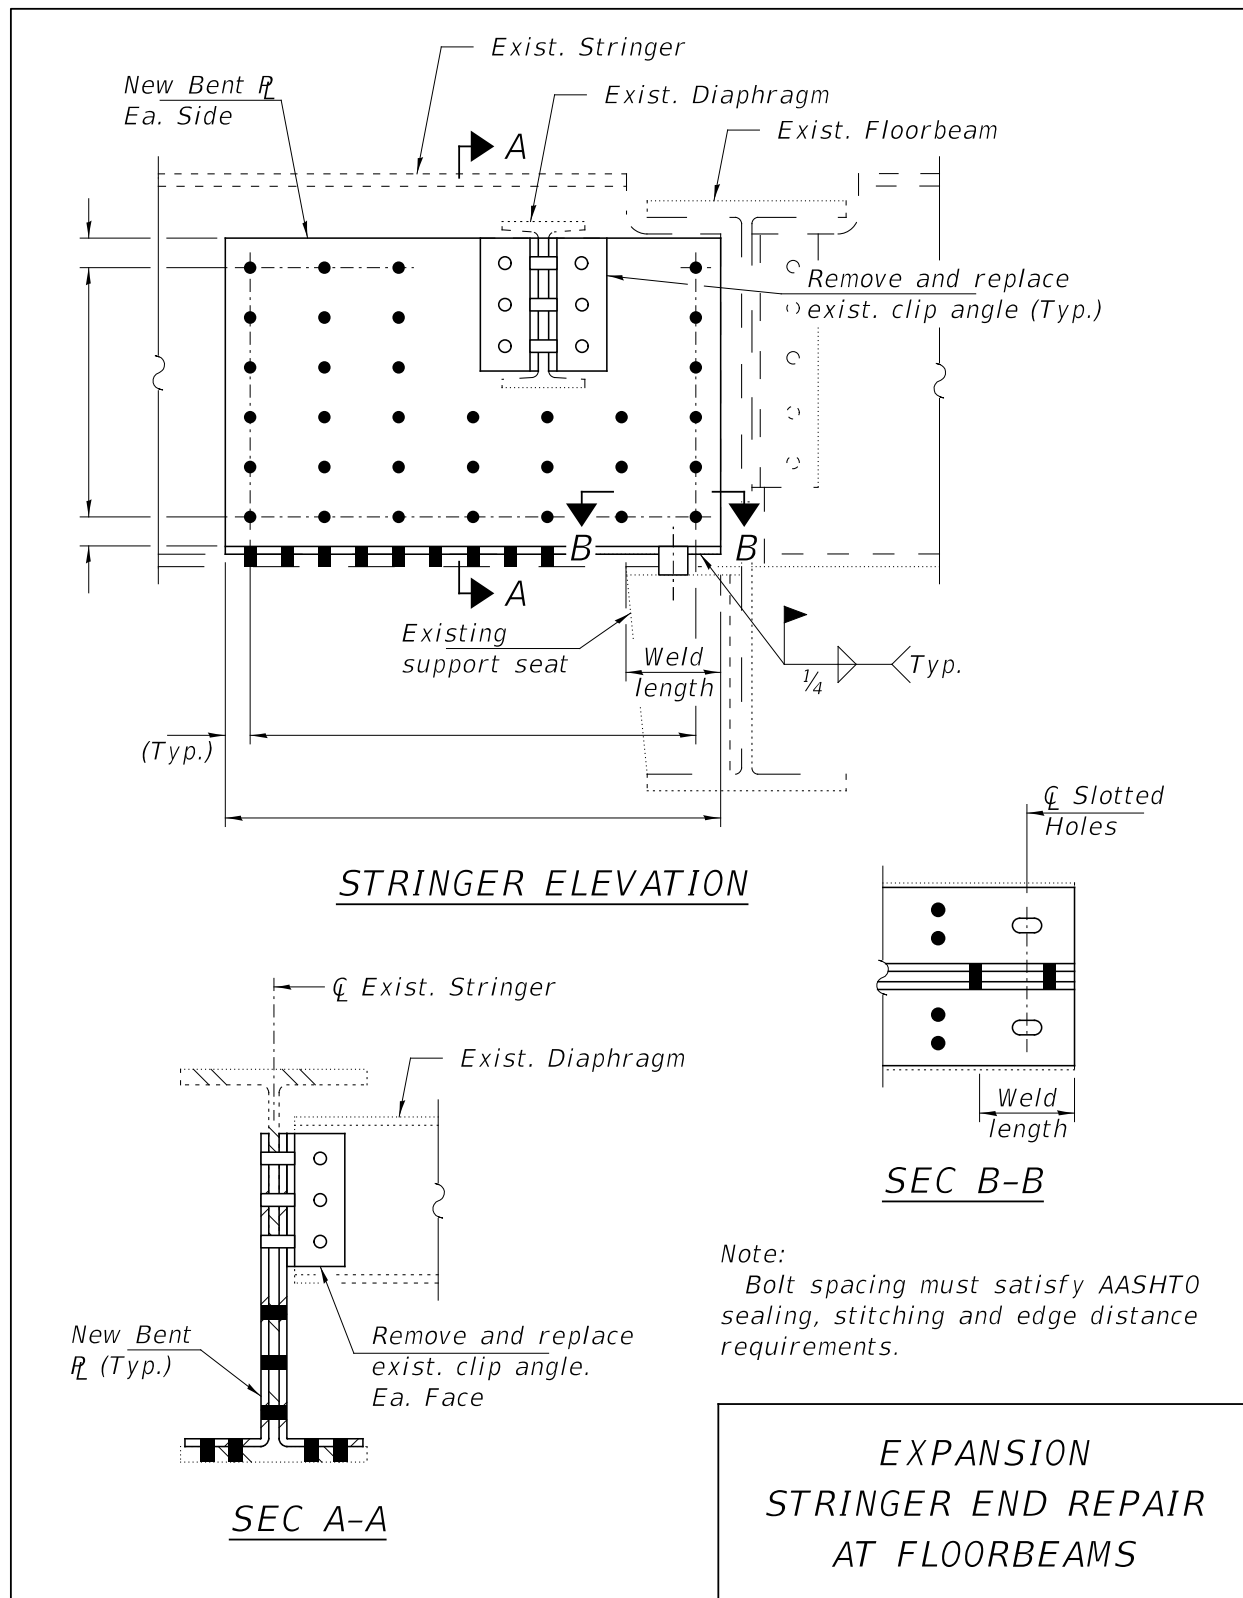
Expansion Stringer End Repair at Floorbeams
